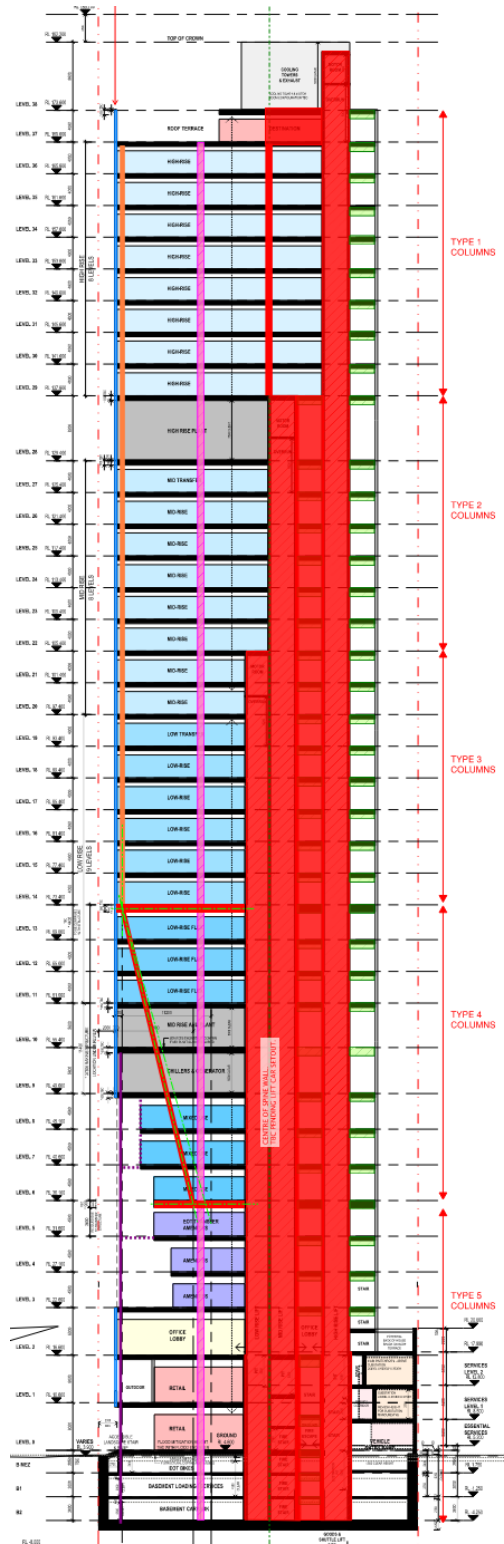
Typical Building Elevations Perpendicular to Albert Street
